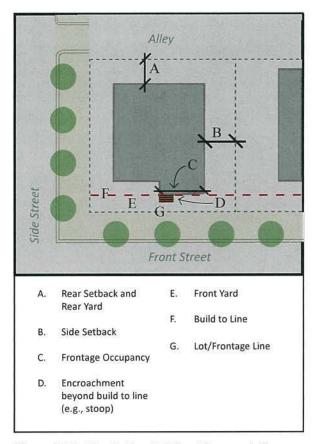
A: Illustrative Building Placement Diagram for Building Types: Front Yard House; Side Yard House; Duplex, Triplex, and Quadplex; Townhouse; and Flex-Loft
